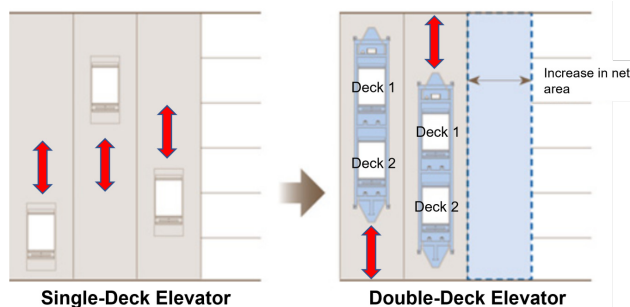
Double-deck elevators save on the number of shafts needed to serve a building.
